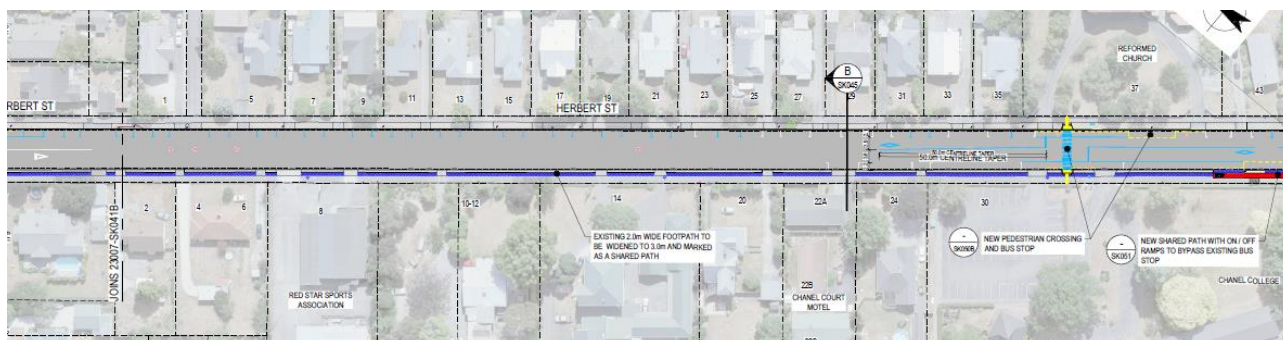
Possible amendment to Herbert Street to avoid parking loss outside of Chanel Court Motel (Option 2)
